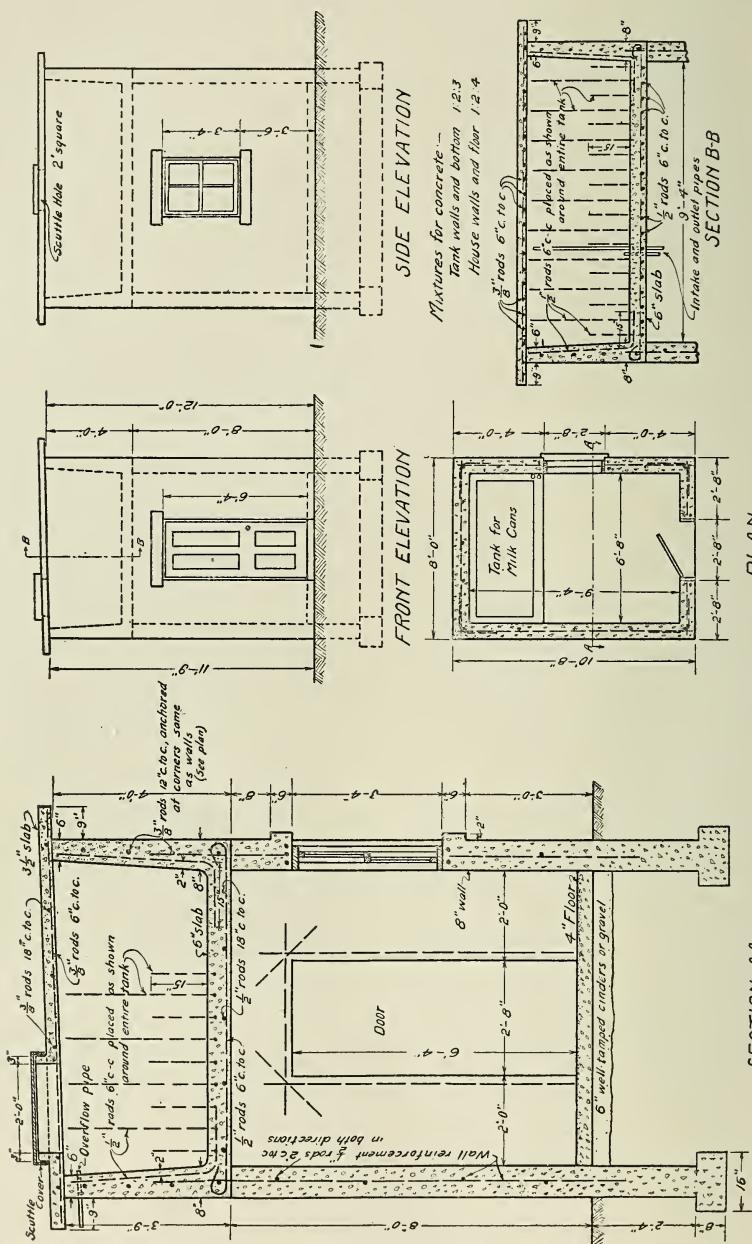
Reinforced Concrete Mills House with Overhead Water Supply Tank.
